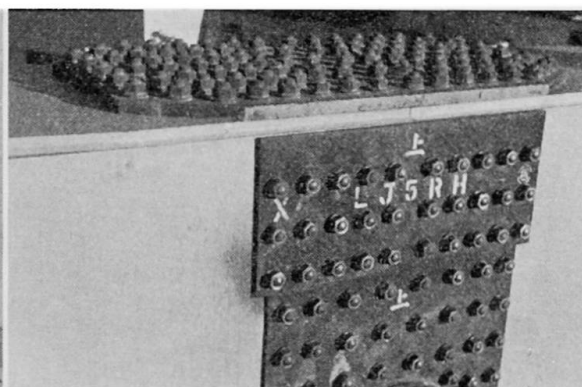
Connection of a stiffening girder of a Lohse girder with box section.
